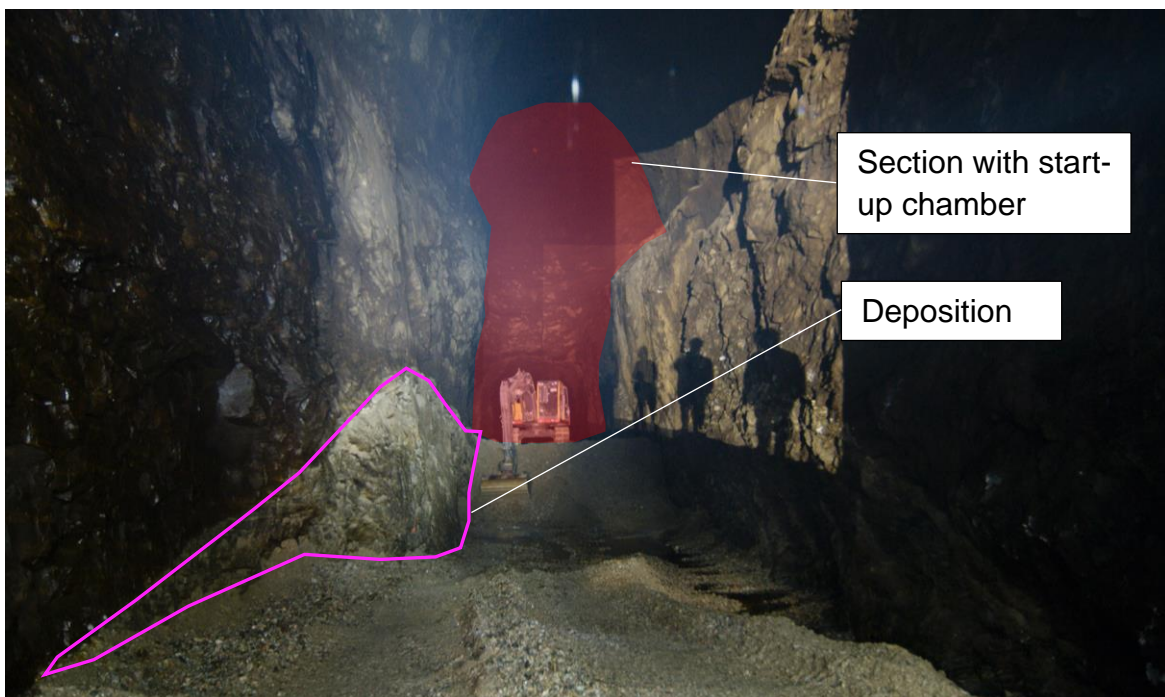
Excavated Sediment in the Tunnel Section at the start-up chamber upstream of the gate section
